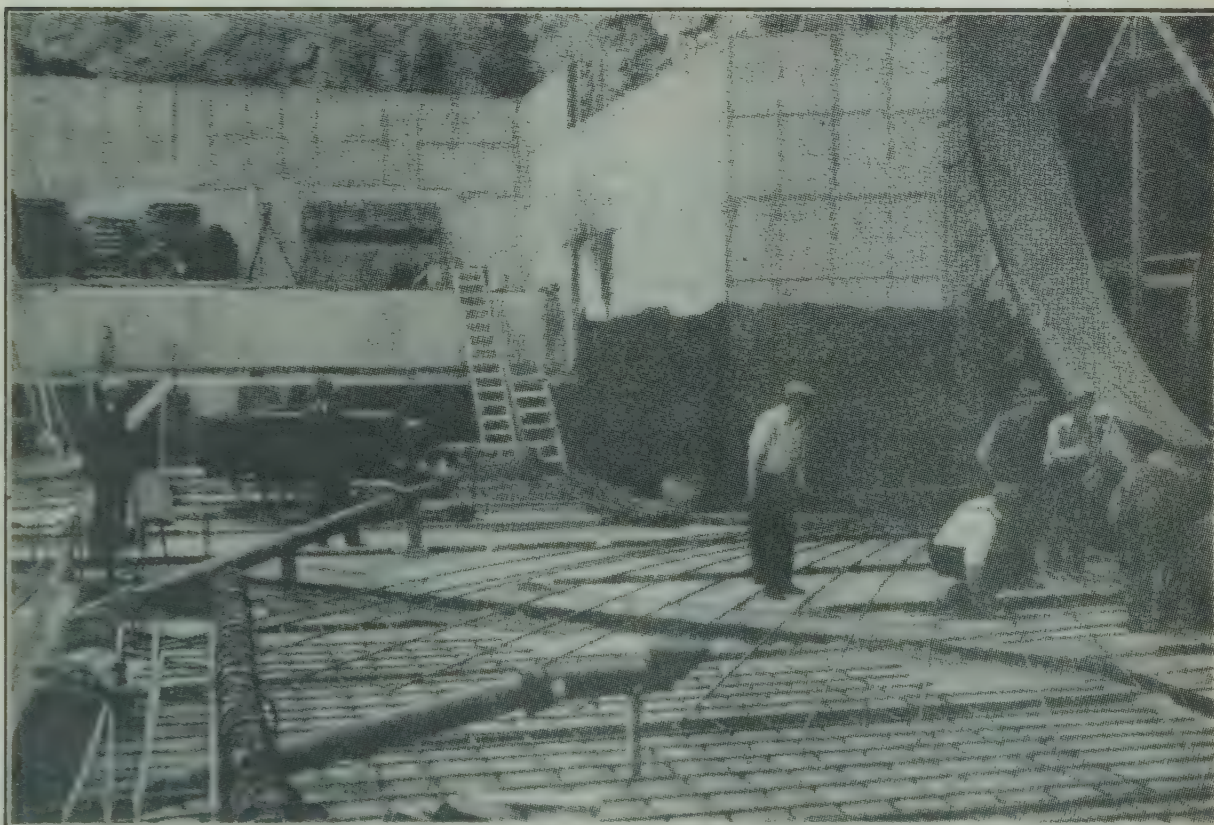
Construction of invert of New Jersey shaft of the Lincoln Tunnel at New York City.
